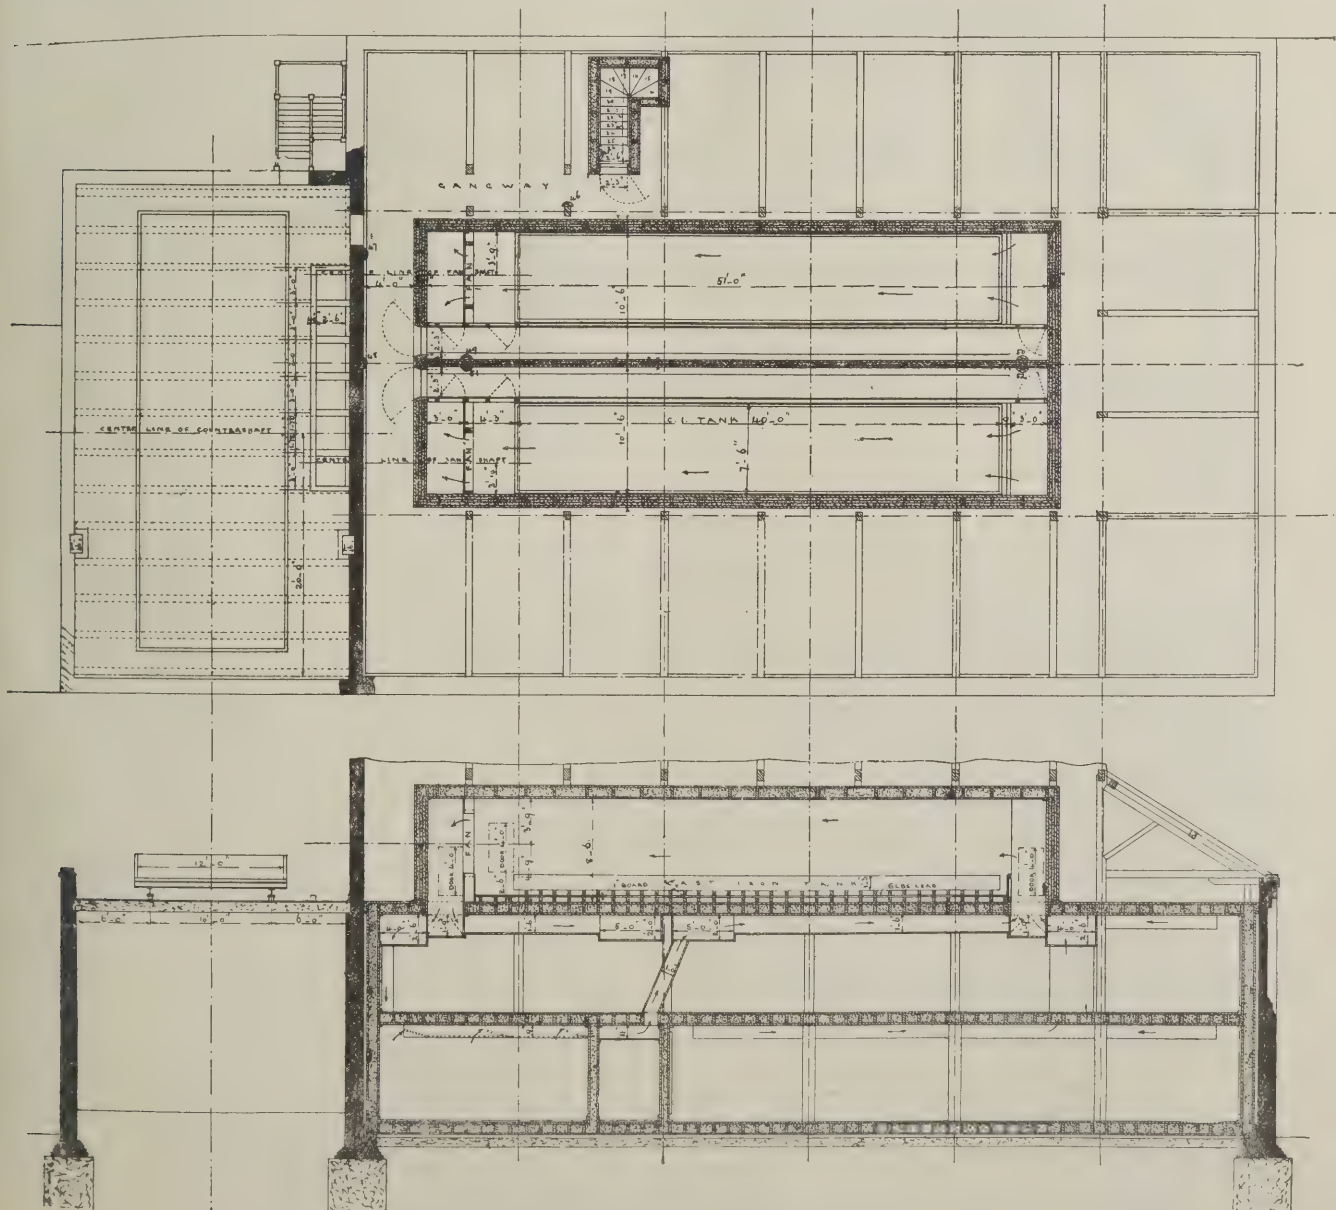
PLAN OF ENGINE ROOM, ROOF, AND AIR-COOLING ROOMS. LONGITUDINAL SECTION.
